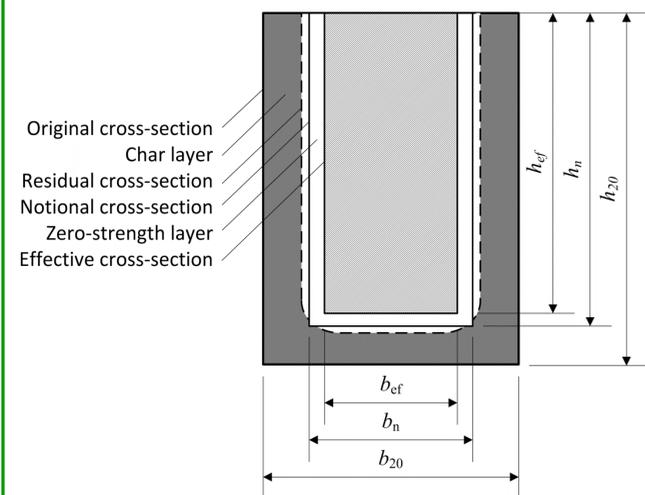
Original and fire exposed timber beam cross section exposed to fire on three sides.
